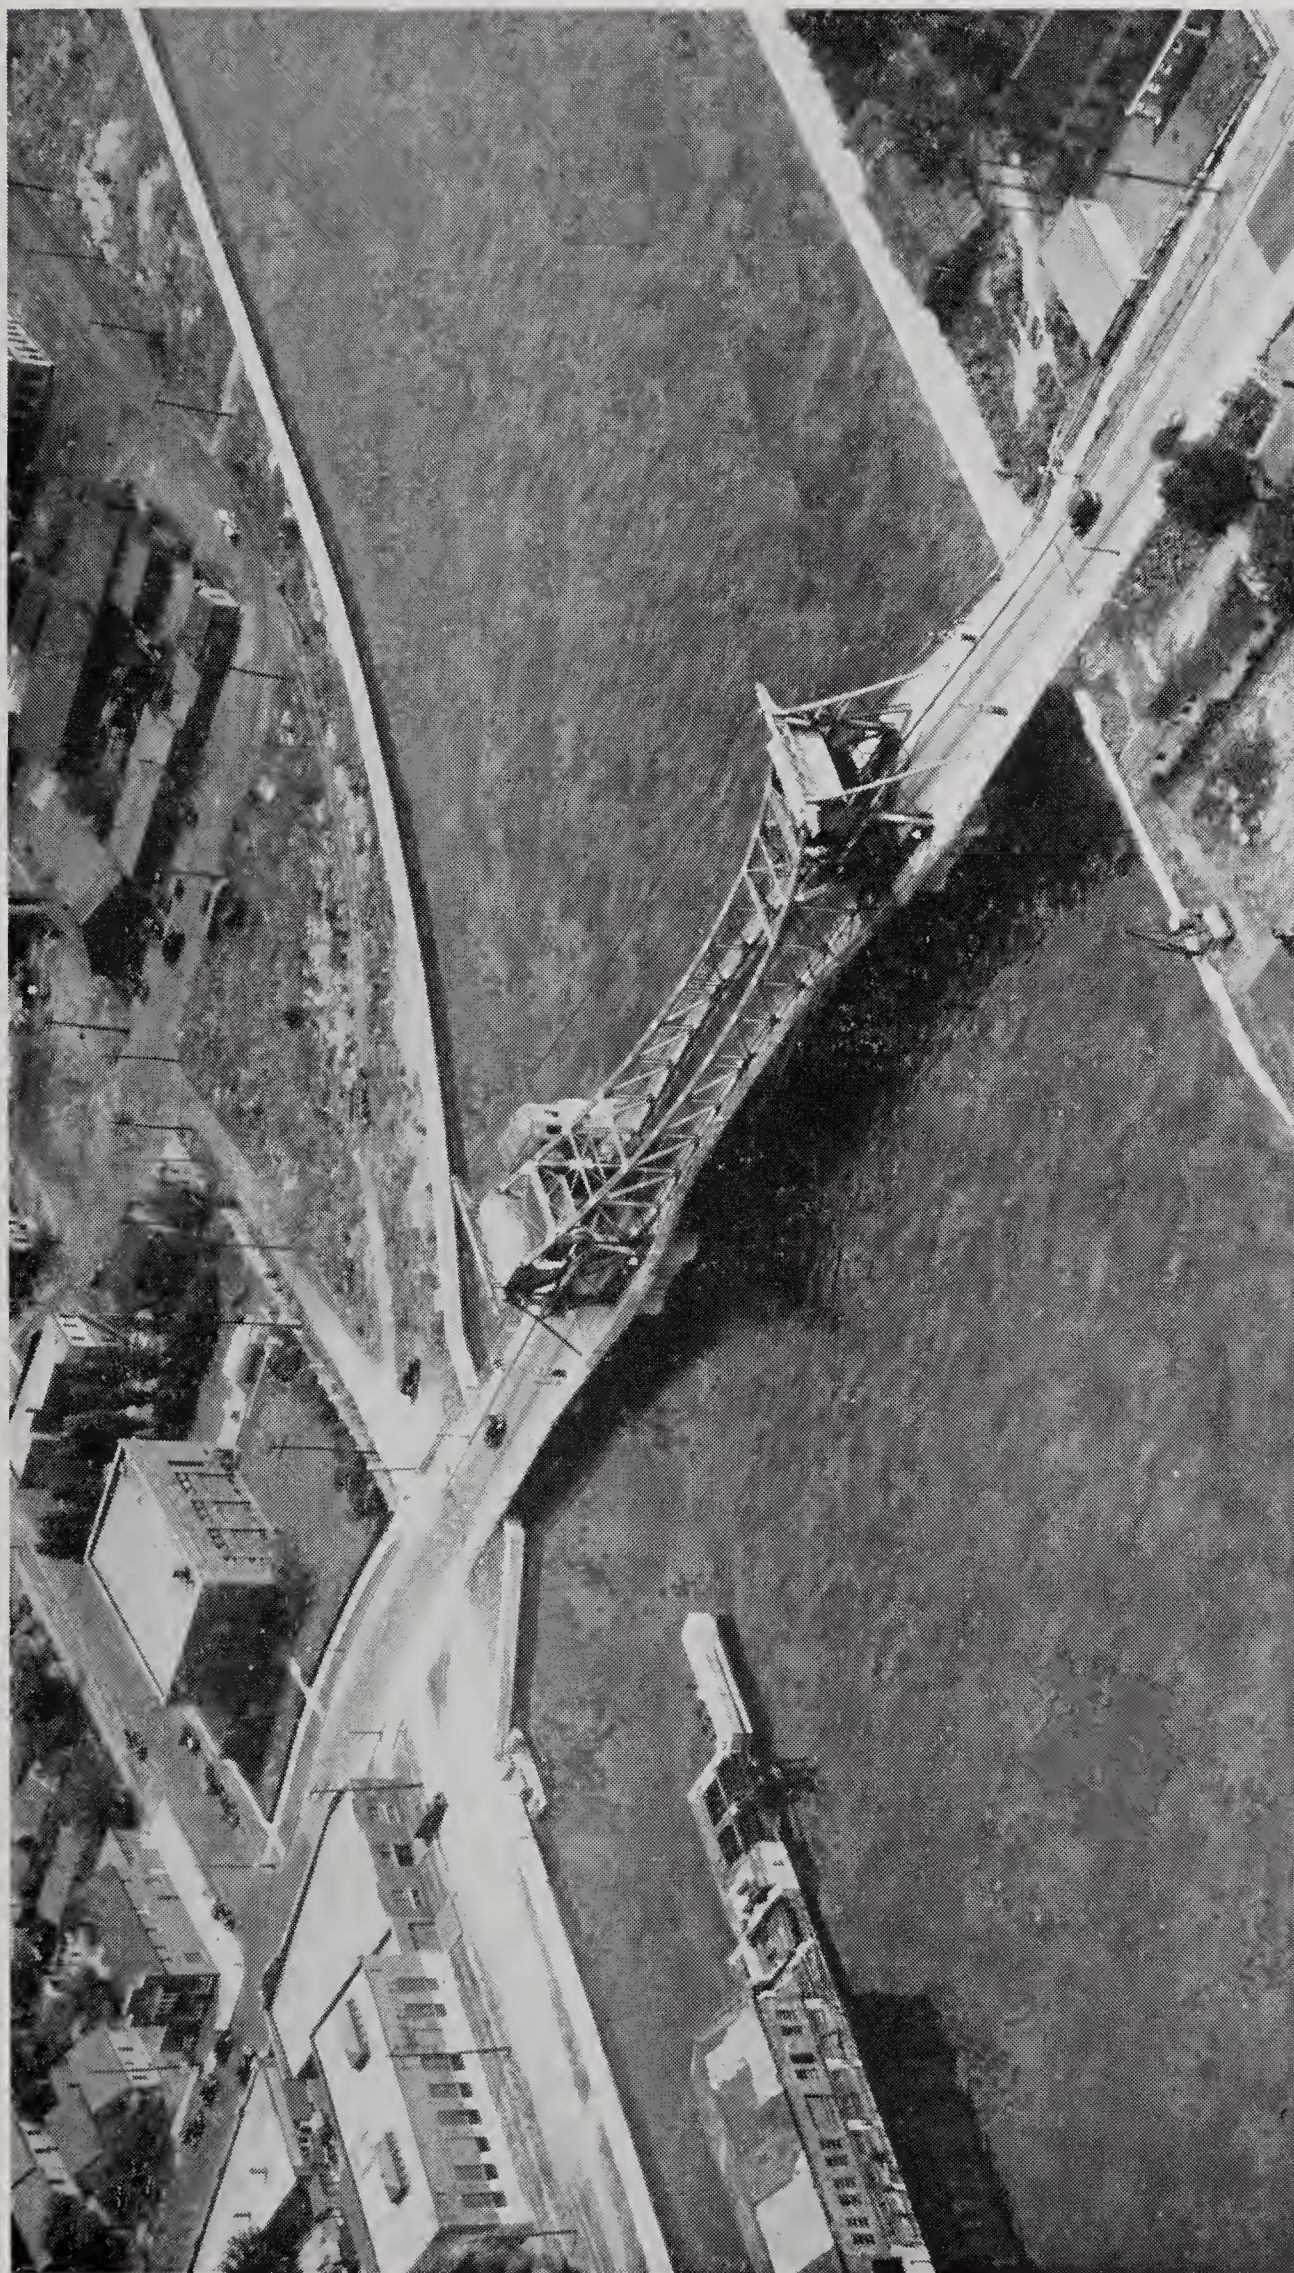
Aerial view of Jackson Street Bridge looking south at Joliet.
